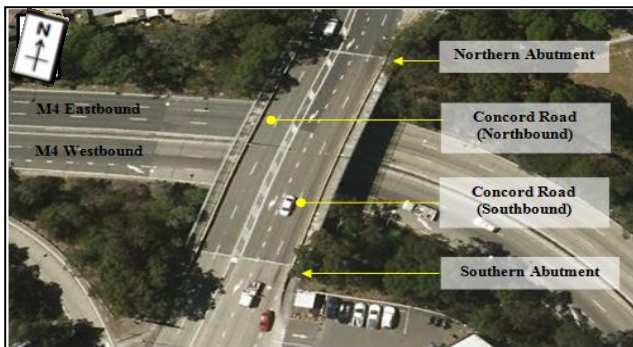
Plan view of the existing Concord Road Bridge circa April 2016 (Google Earth, 2017)
